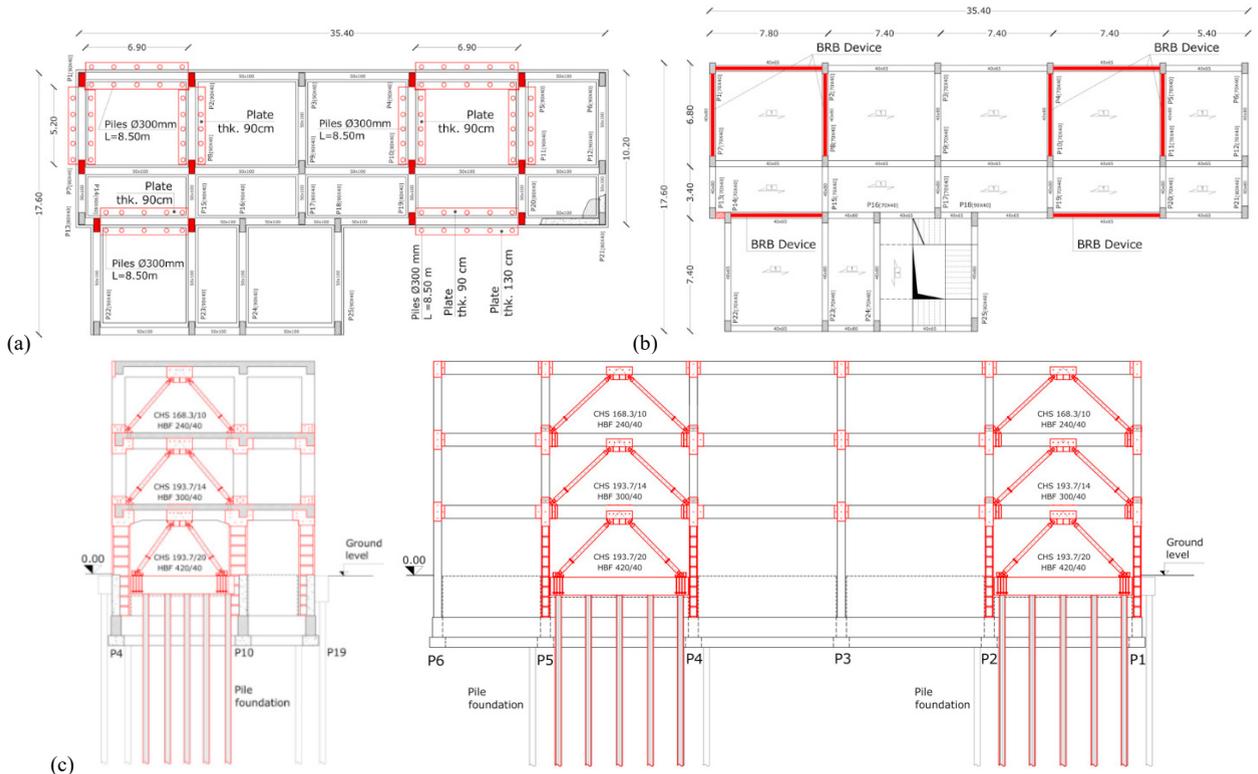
(a) Retrofit of existing foundations; (b) Layout in plan of the damped braces; (c) Section views.
